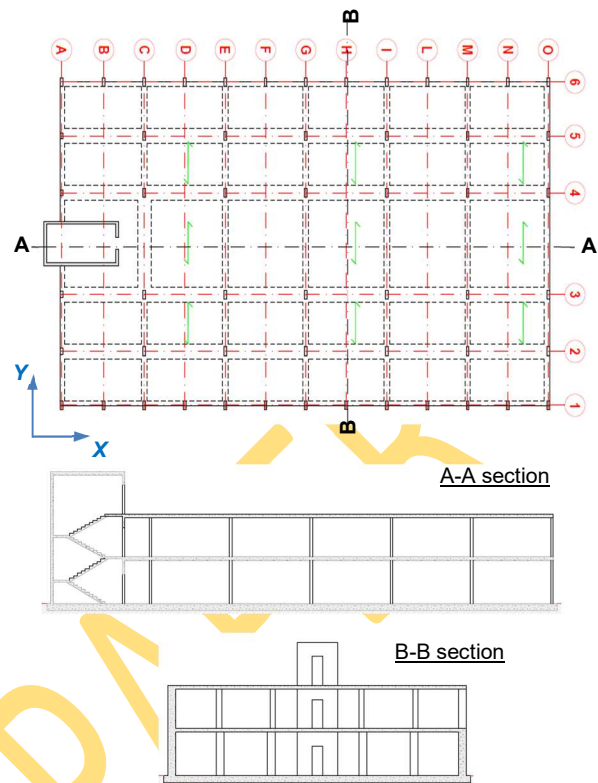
Ground Storey Structural Plan, Longitudinal and Transversal Sections of Case Study Building
